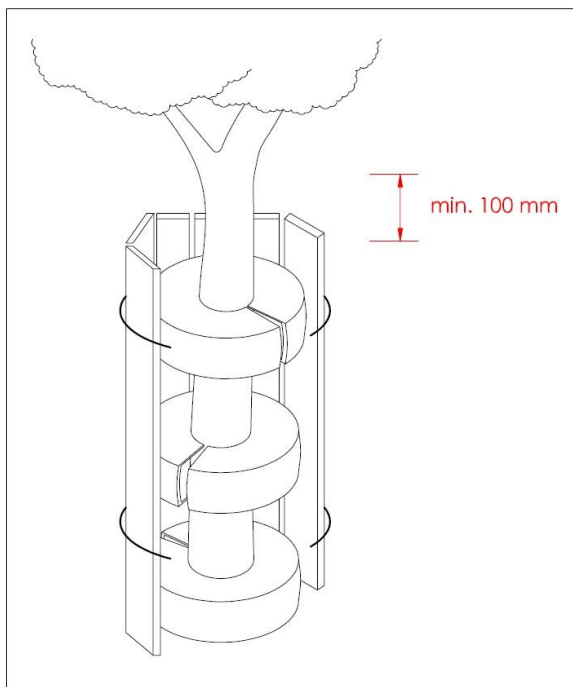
Trunk protection – model example 2 (4.2.4.2)
